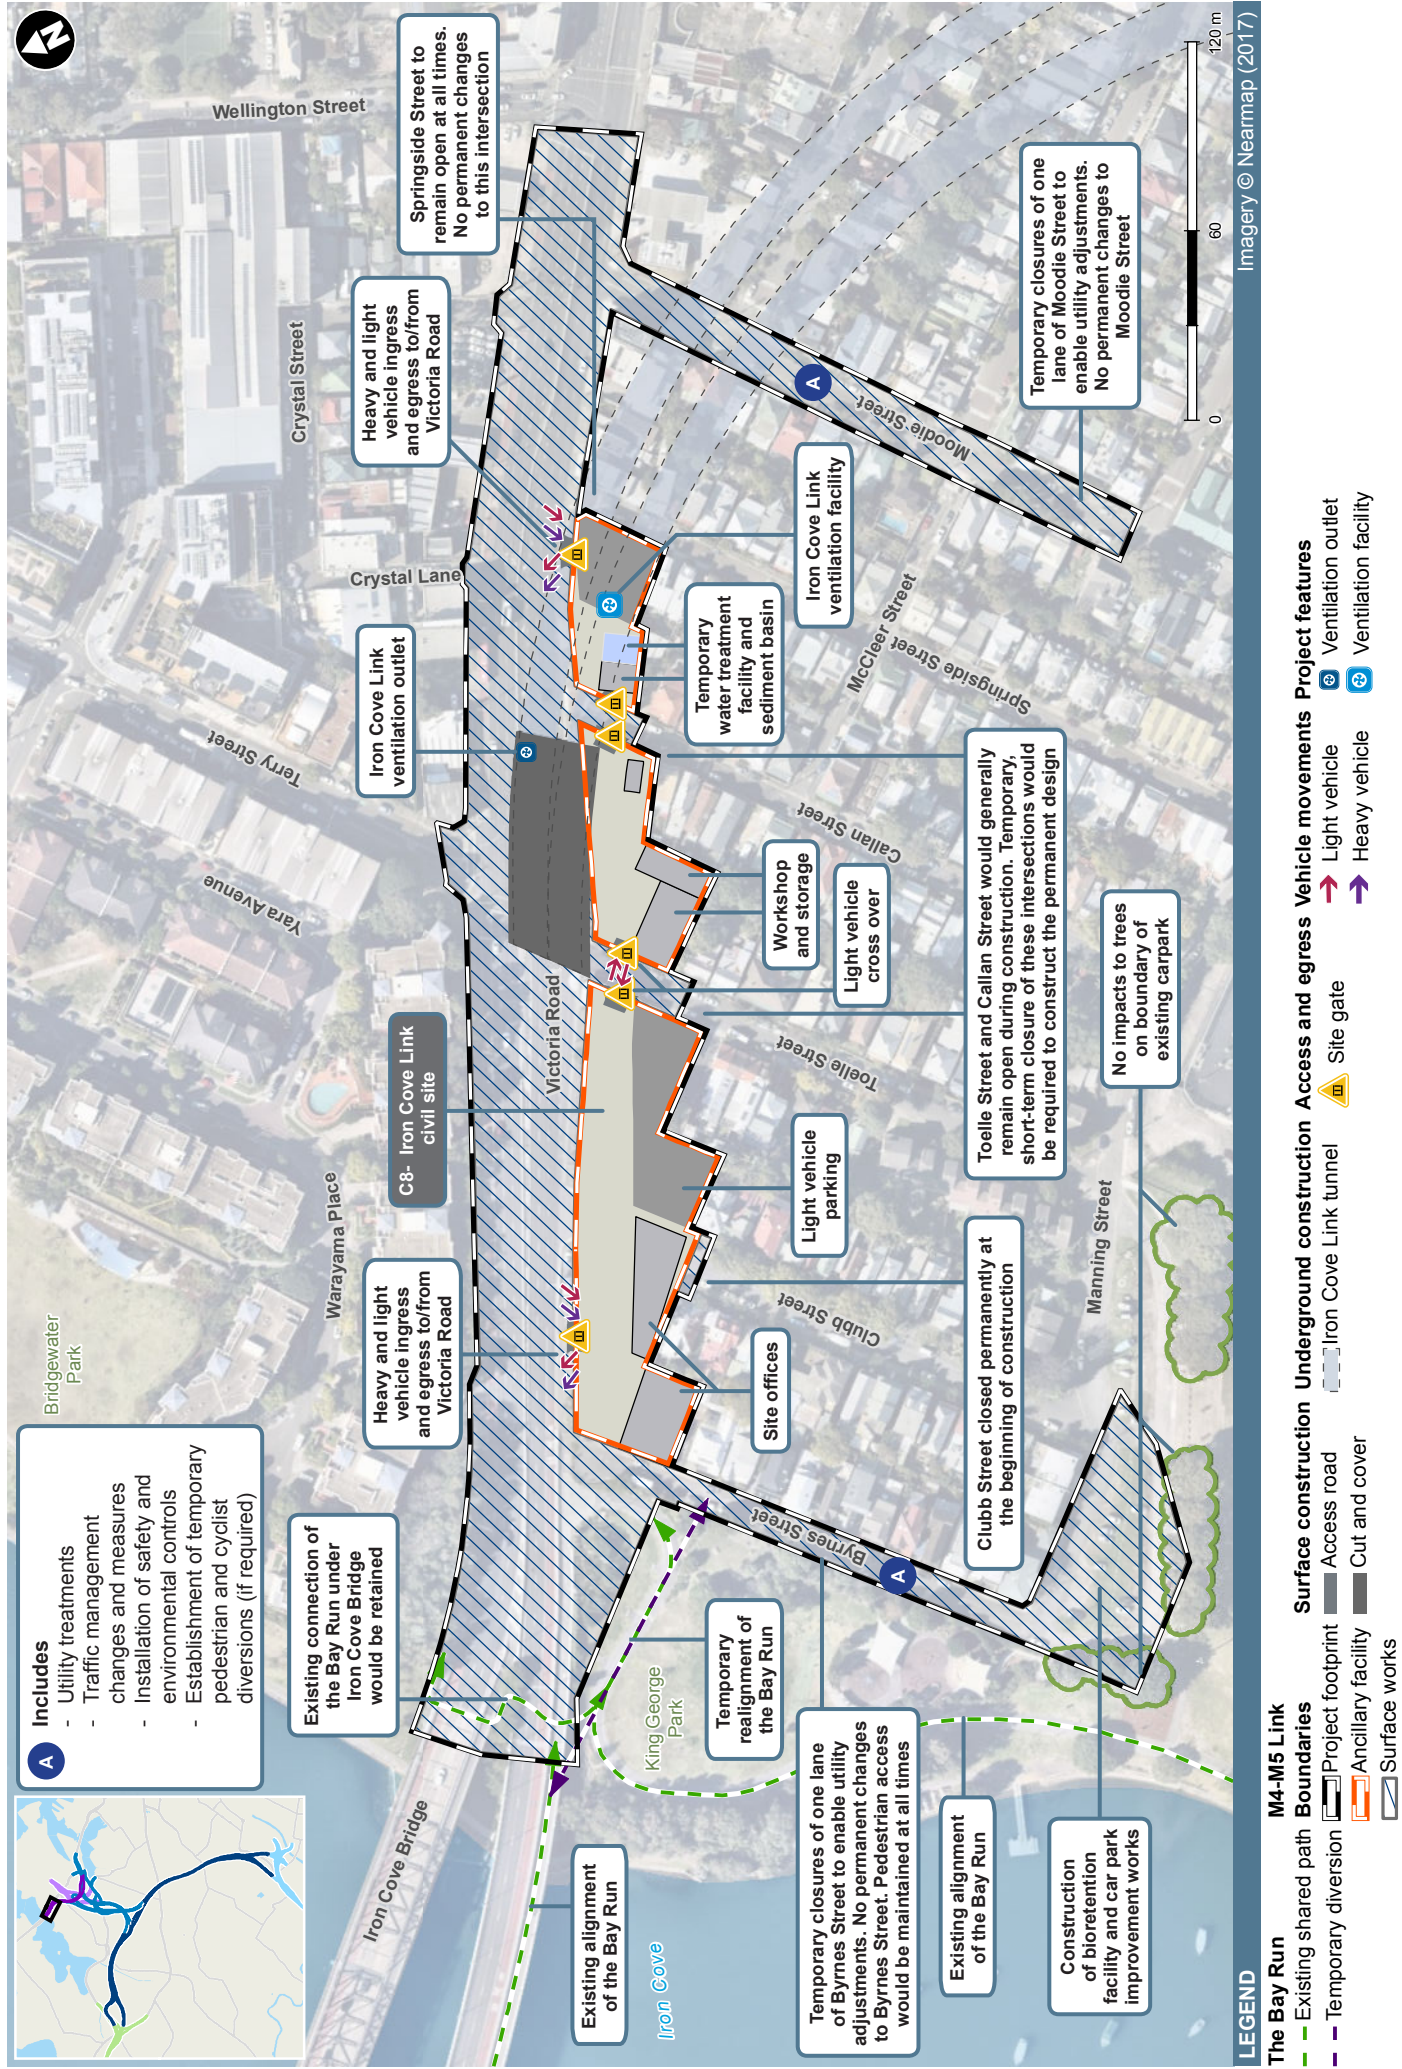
Indicative Iron Cove Link civil site (C8) layout
